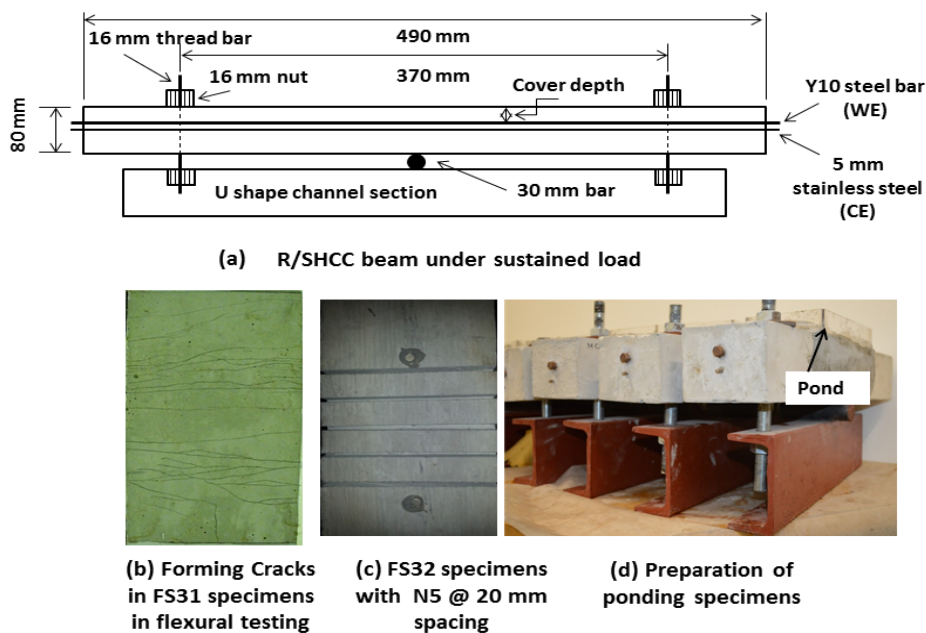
(a) R/SHCC specimen geometry and setup in steel frames, (b) crack pattern on the upper, tensile face, (b) notches for pre-set crack spacing of 20 mm on the upper, tensile face and (d), R/SHCC beams subjected to ponding on the upper, tensile faces (Paul and Van Zijl 2016).
